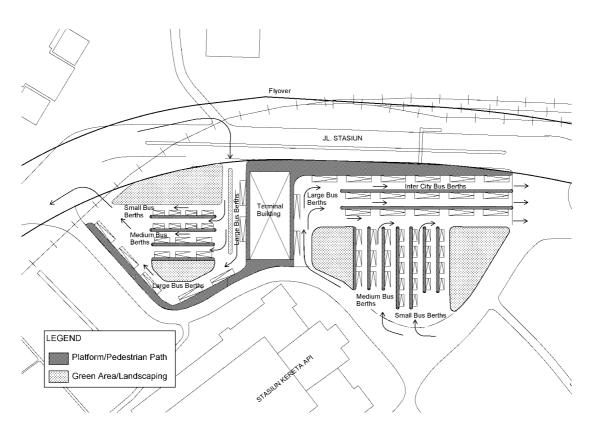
B-8 Proposed Layout Plan for the Alternative-1
